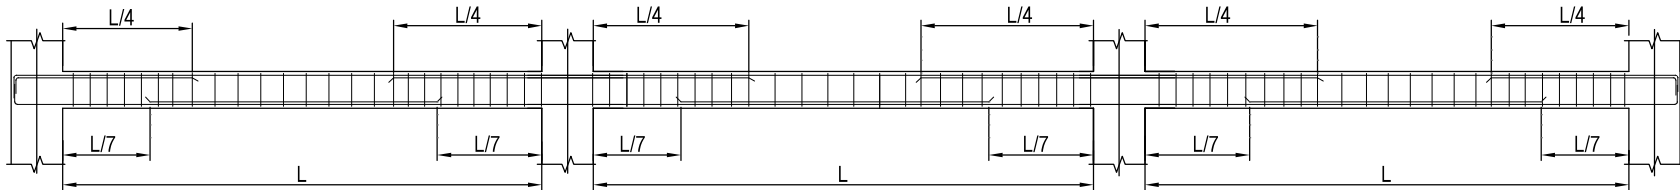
@ SUPPORT (SCALE - 1:15)
